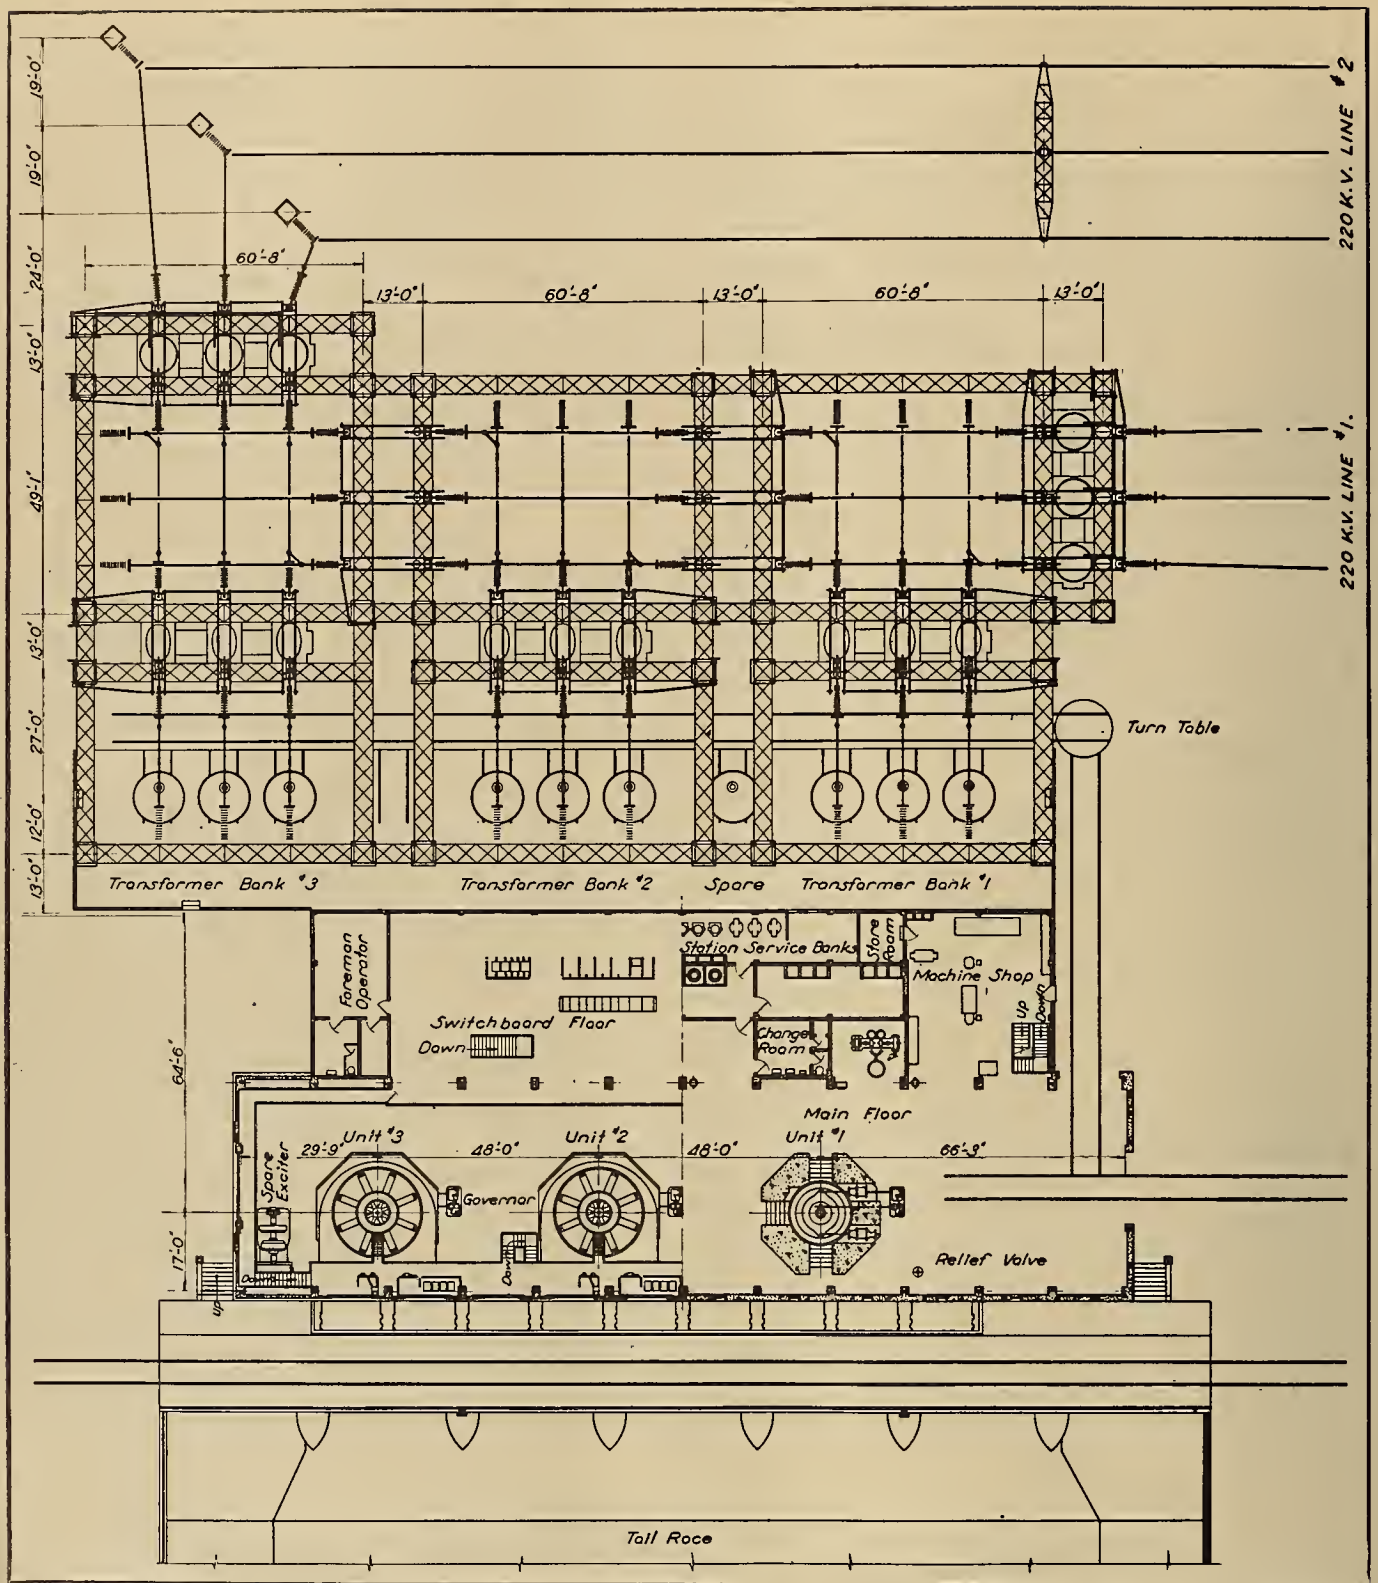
Plan view of power house and bus yard with a partial section of power house indicating arrangement on main floor beneath switchboard floor and showing section of generator pedestal.
